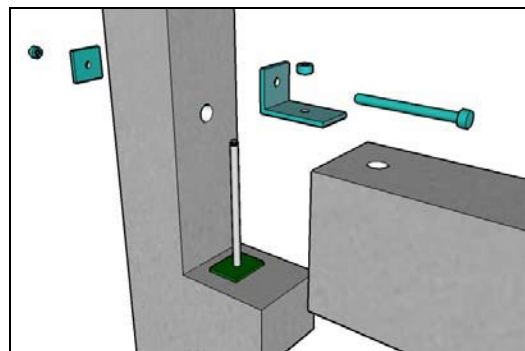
Proposed hybrid beam-to-column connection in precast concrete frame.
